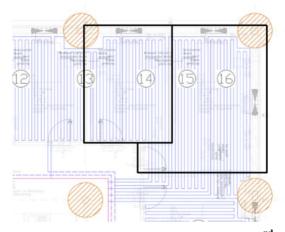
Pipe laying north-west corner 2<sup>nd</sup> floor
